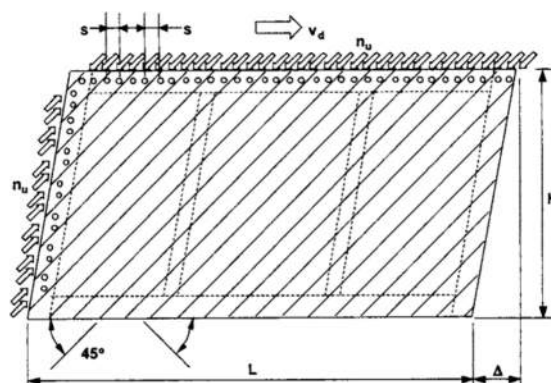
Diagonal Lumber Shear Wall Sheathing Diagram
